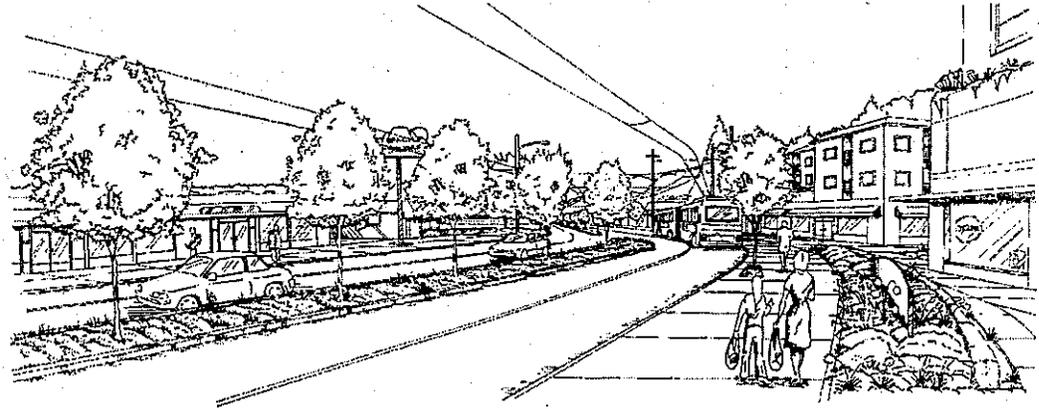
Proposed Landscaped Median for Rainier Avenue S at Beach Square
